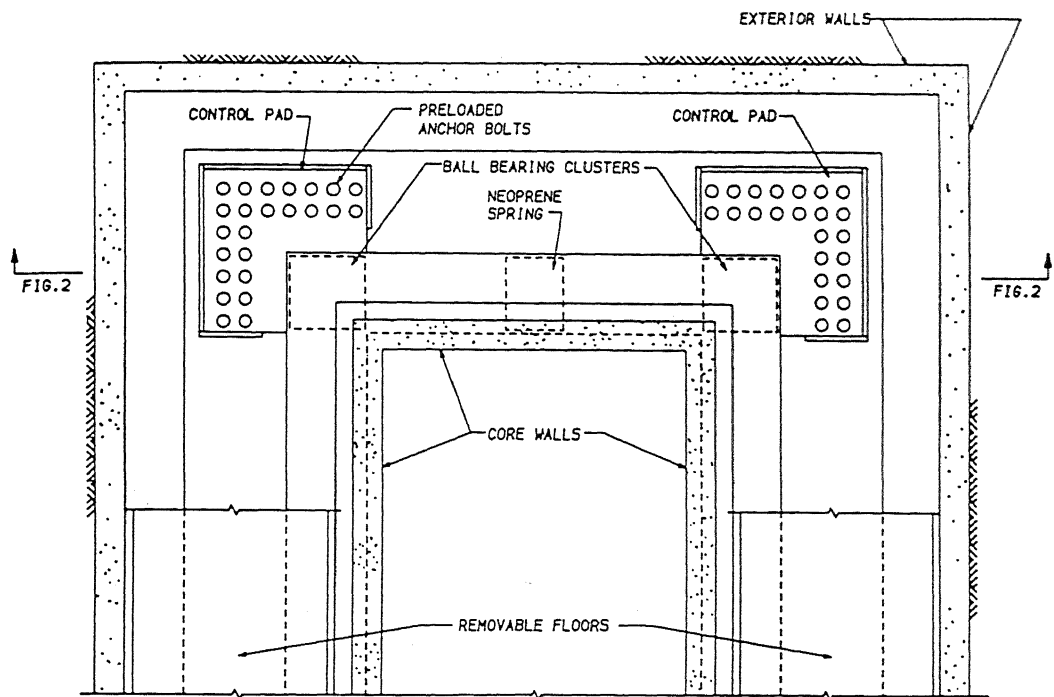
SECTIONAL PLAN OF THE BASEMENT FLOOR LEVEL AT ONE END OF A CONCRETE CORE WALL STRUCTURE
